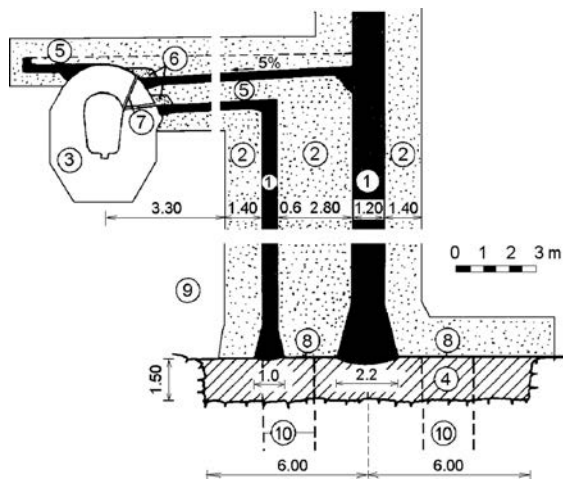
Joint of the asphaltic concrete core with the foundation, High Island dams (Hong Kong). (1) Asphaltic concrete core; (2) transition zone; (3) control gallery; (4) concrete foundation slab; (5) upper and lower asphaltic concrete blanket; (6) filter material; (7) upper and lower drainage pipe; (8) asphaltic mastic; (9) rockfill; (10) grout curtain.
